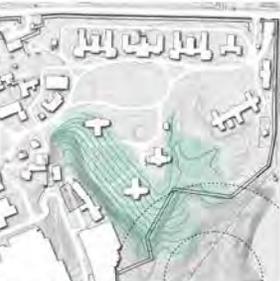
Plateau Site - Area impacted by potential 6:1 Slope Stabilization shown in Green
